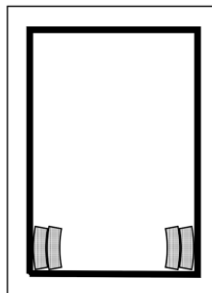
Section of a concrete beam with bundled bamboo reinforcement
